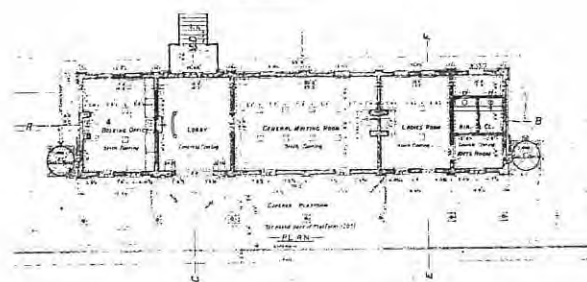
The floor plan of the building dated 1887 and showing the single platform on the Queensland side. [Courtesy RHC, L2399].
